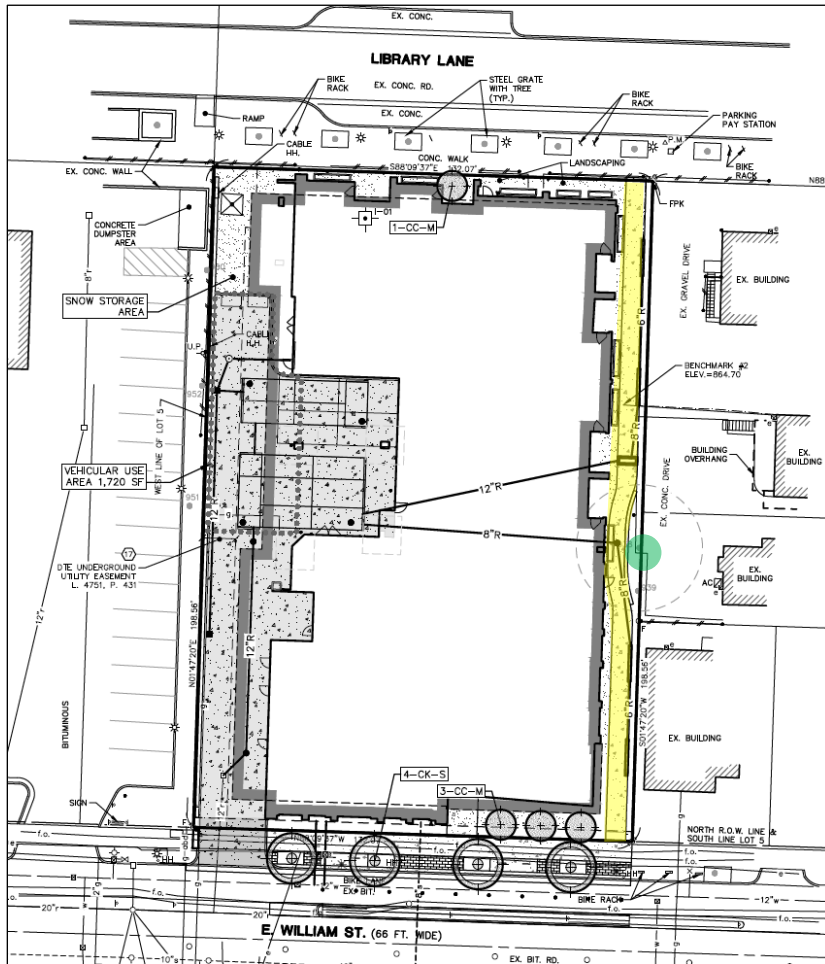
Excerpt site plan showing landmark tree (green) and proposed pedestrian connection (yellow)
